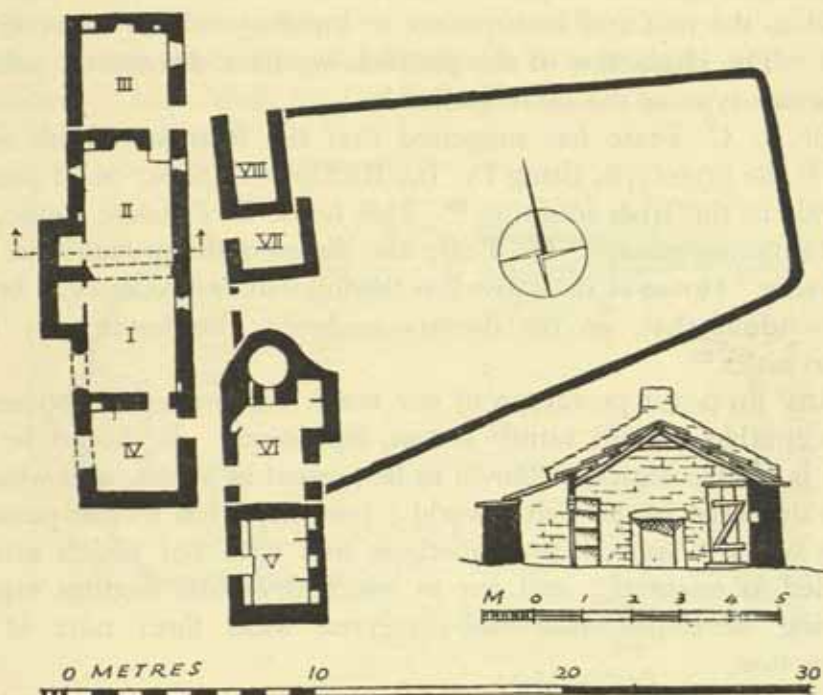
Tueaberry, Birsay, Mainland: plan of steading and cross-section showing outshut
